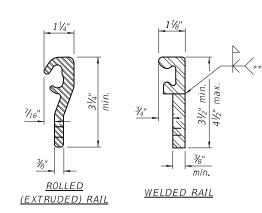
DETAIL-NEW CONCRETE DECK AND WELDED RAIL JOINT
